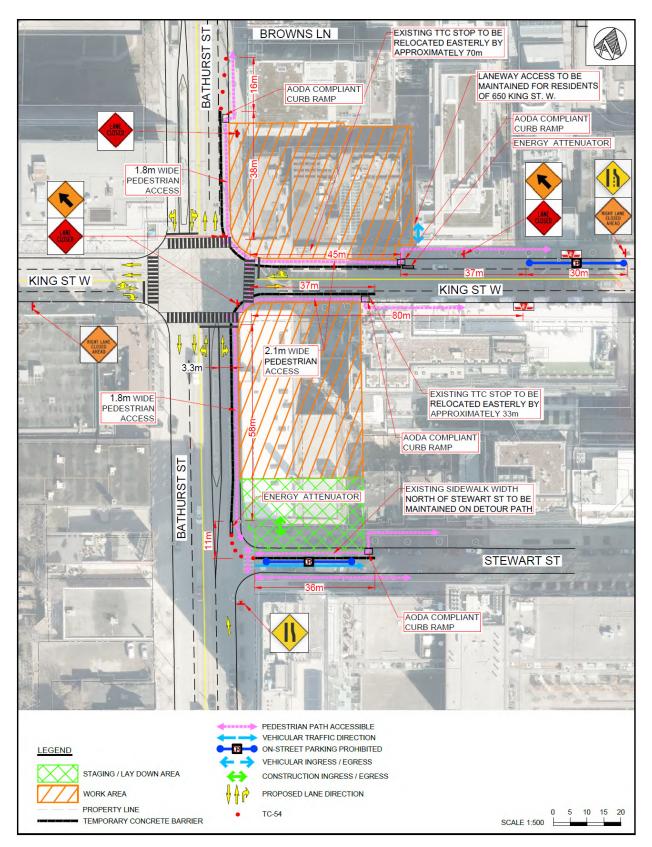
King Street / Bathurst Street - Traffic Staging Plan
